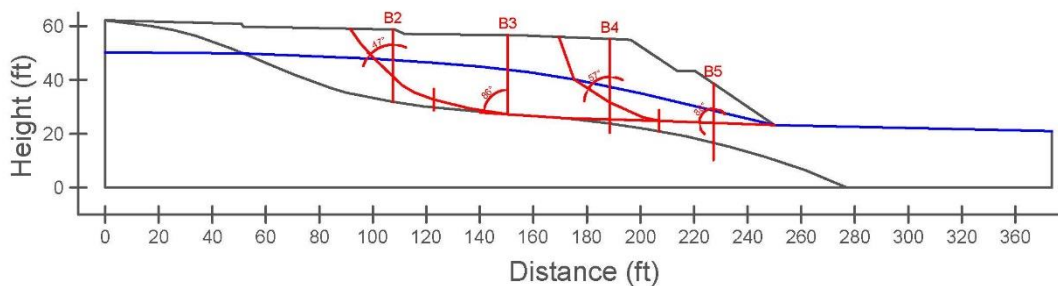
Sub-sectioning of the cross-section and failure planes for Shibecha-Cho Embankment
